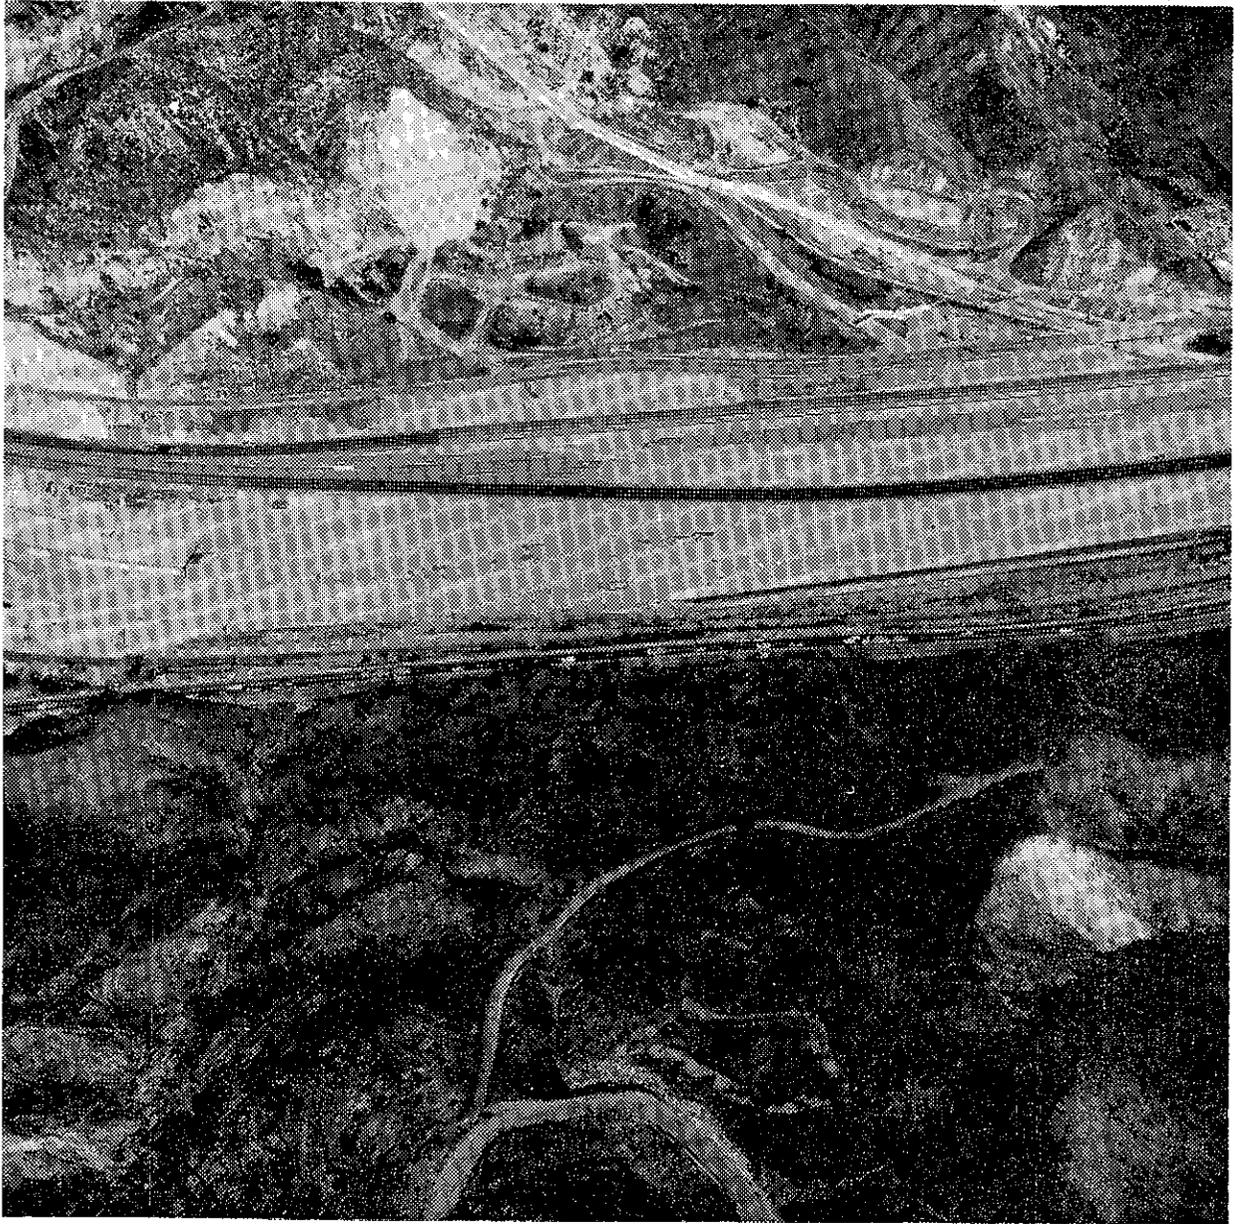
Looking easterly at Route 5 immediately north of Balboa Boulevard Overcrossing.
